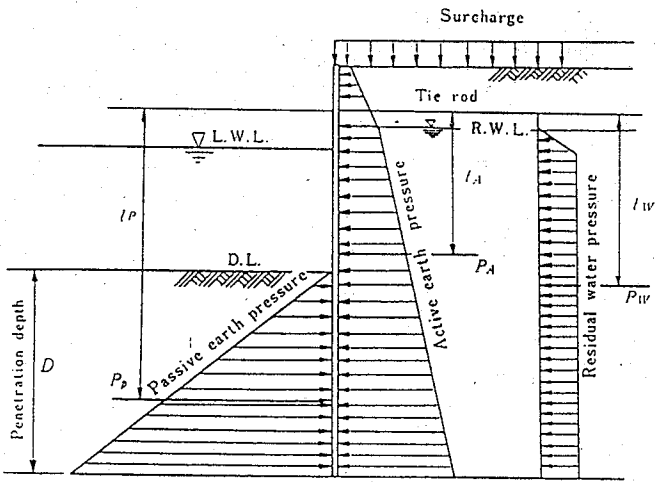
Earth and Water Pressures Acting on Sheet Pile Wall
